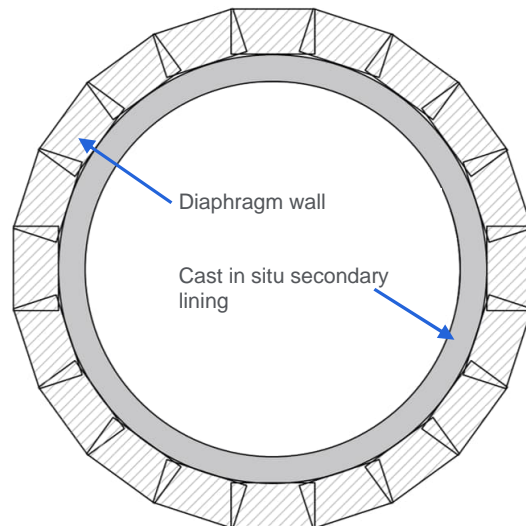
Schematic plan view of completed shaft with diaphragm walls
